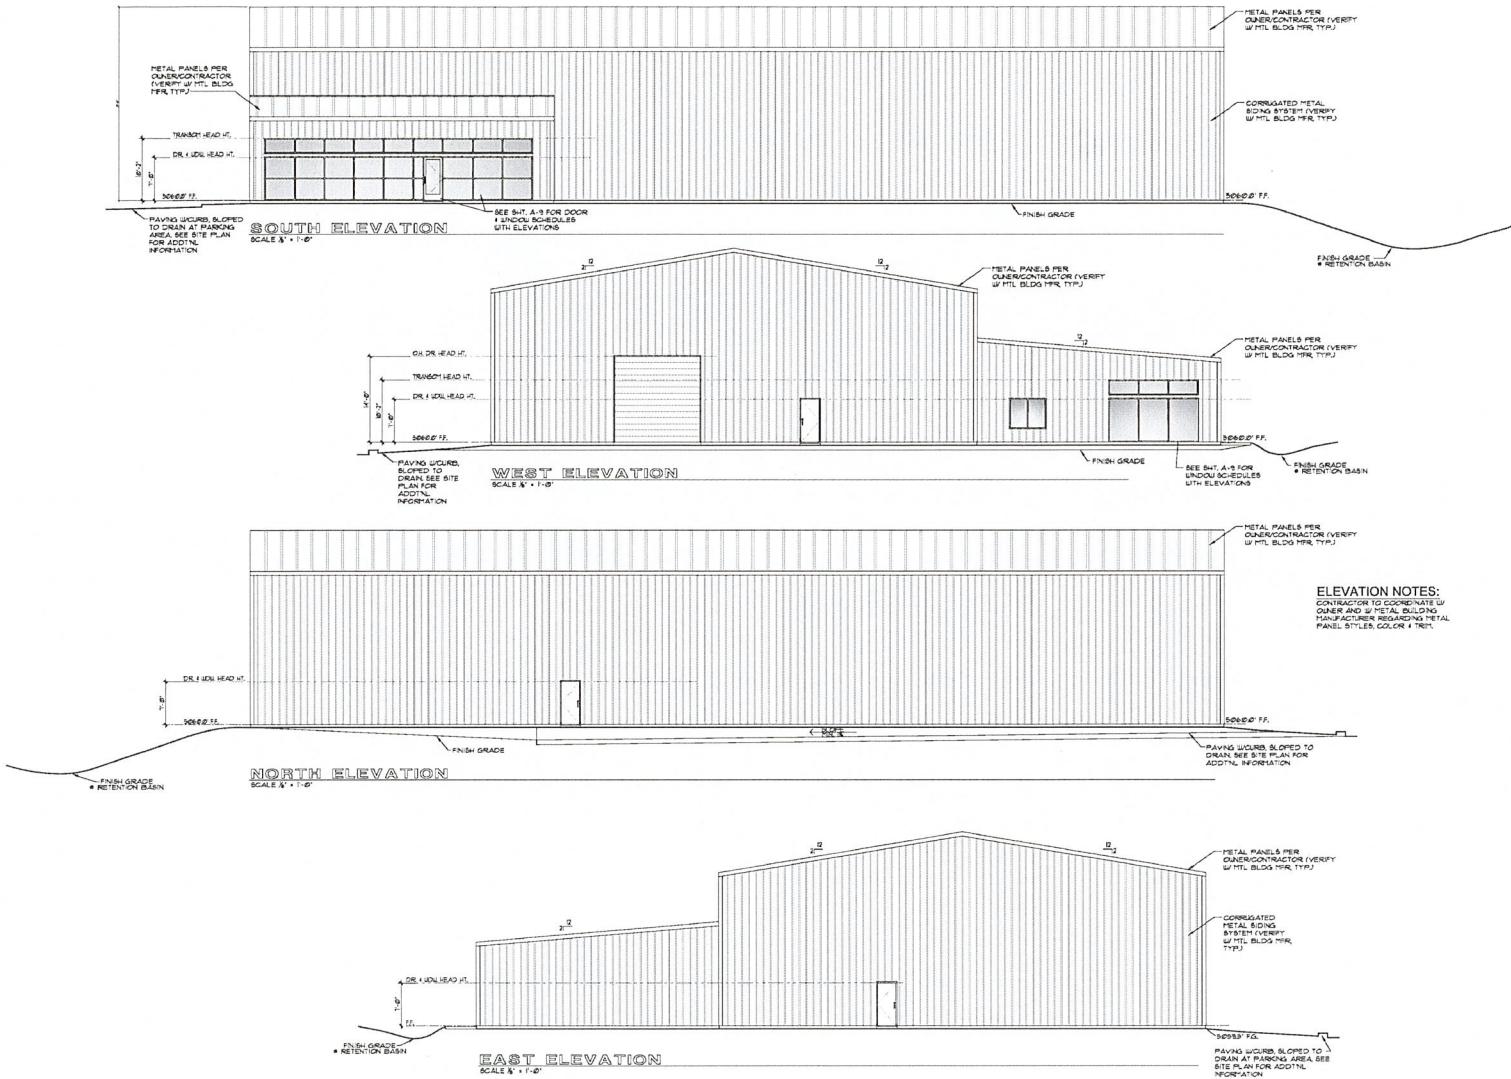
(below) depicts the project site plan, while Figure 6 (following page) depicts the preliminary building elevations proposed for Admunson Roofing.
